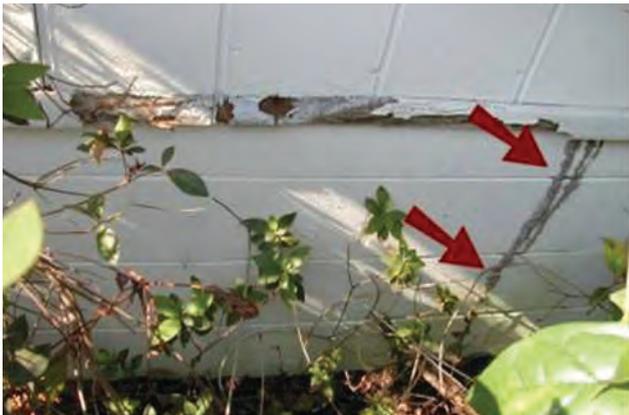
Termite Tube Extending from Ground to Wall [Red Arrows] [13]
